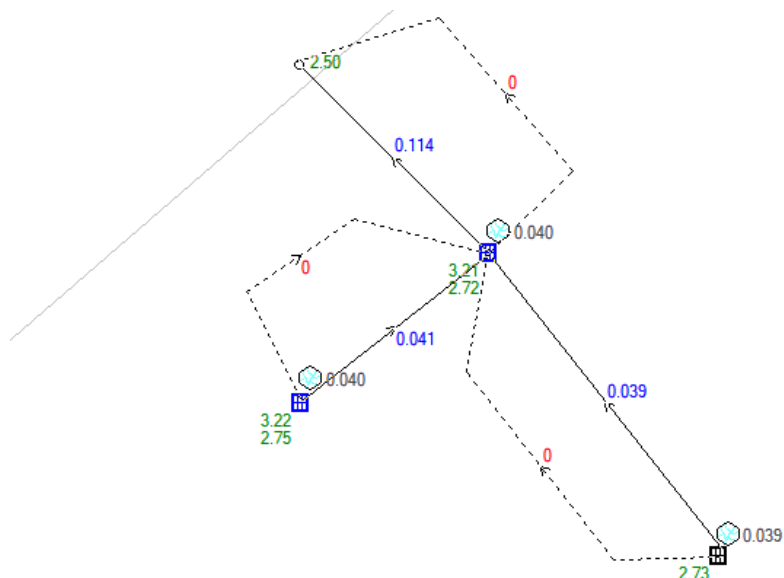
0.2 EY Proposed Berth 6 Extension connection to existing cargo shed outfall pipe
